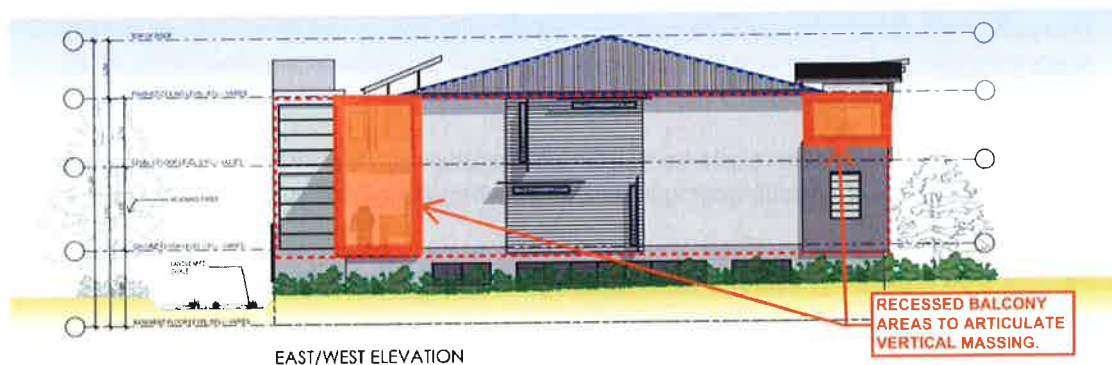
Typical Apartment Block Side (East/West) Elevation Contextual Elements
